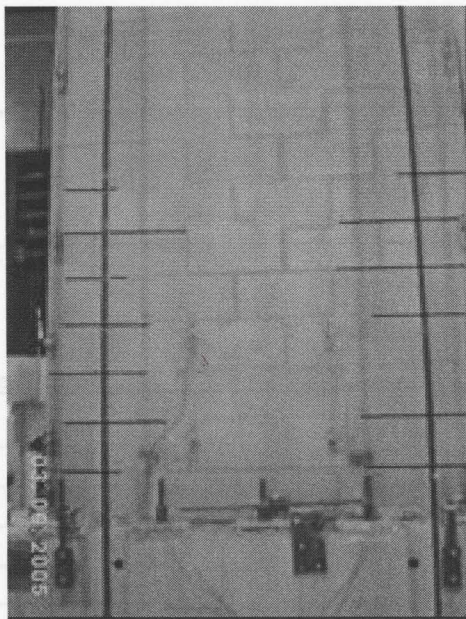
67: Cracks at 8 mm (Wall 6)
